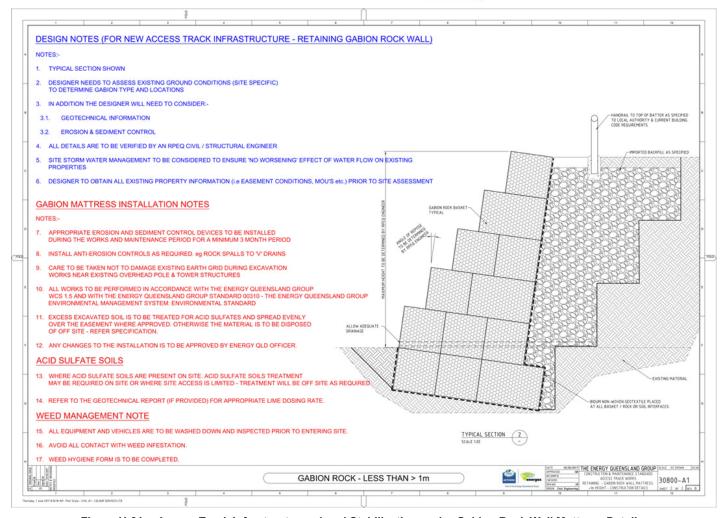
Access Track Infrastructure – Land Stabilisation – >1m Gabion Rock Wall Mattress Details.
